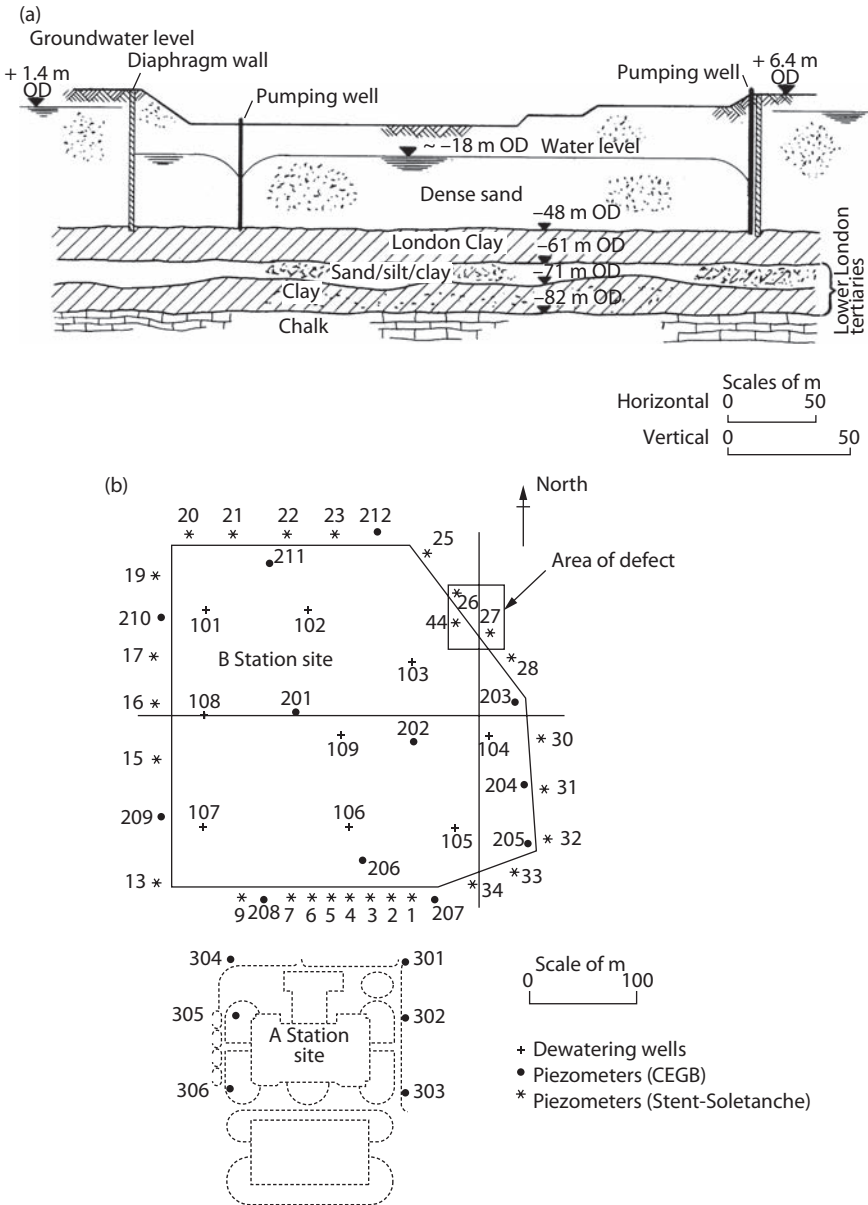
Use of diaphragm wall at Sizewell B Power Station. (a) Typical geological section showing diaphragm wall and dewatering wells. (b) Position of dewatering wells and monitoring piezometers. (From Howden, C., and Crawley, J. D., *Proceedings of the Institution of Civil Engineers, Civil Engineering, Sizewell B Power Station*, 108, 48–62, 1995; reproduced by permission of ICE Publishing.)
